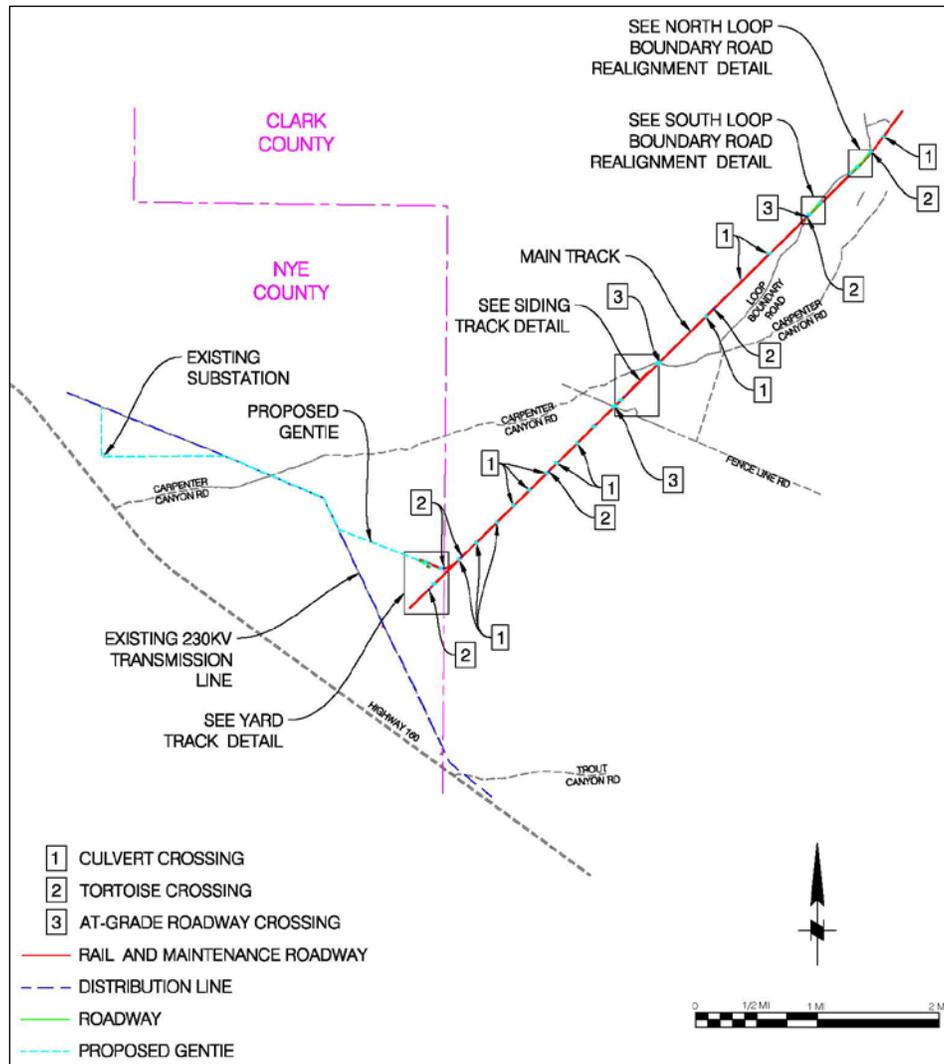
Proposed culvert, road, and tortoise crossing locations within the rail corridor for the Alternative.
